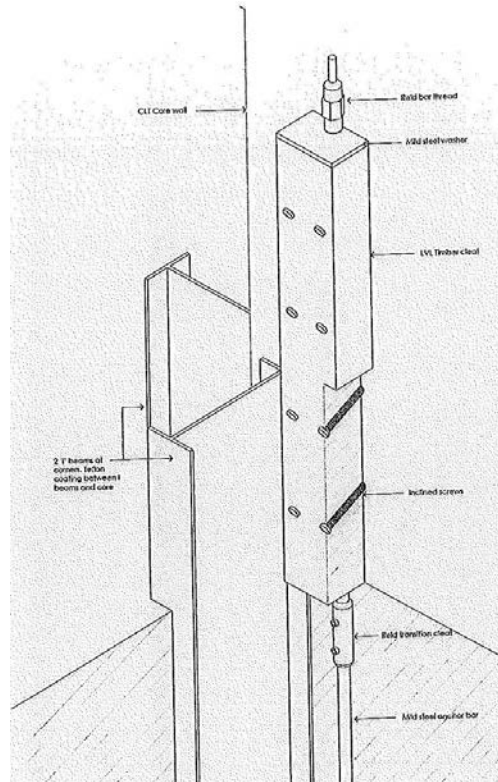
Part isometric of IPC foundation connections showing pairs of steel members at corners to prevent IPC translation, and one of the vertical hold-down bars. (Sketch is diagrammatic)
